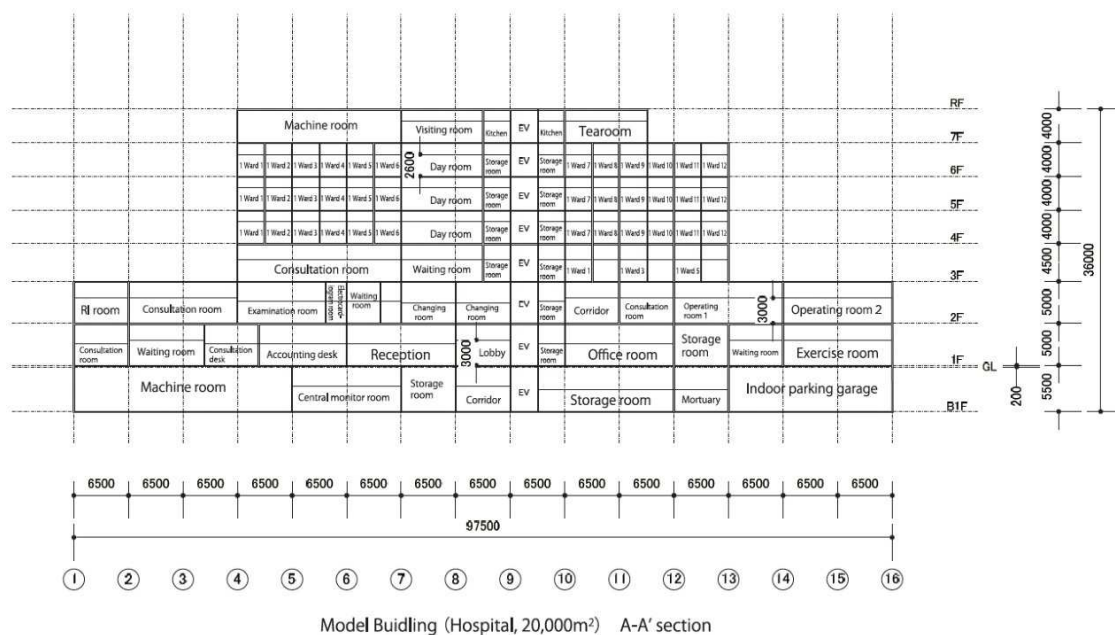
Model building (hospital, 20 000 m²) A-A' section
